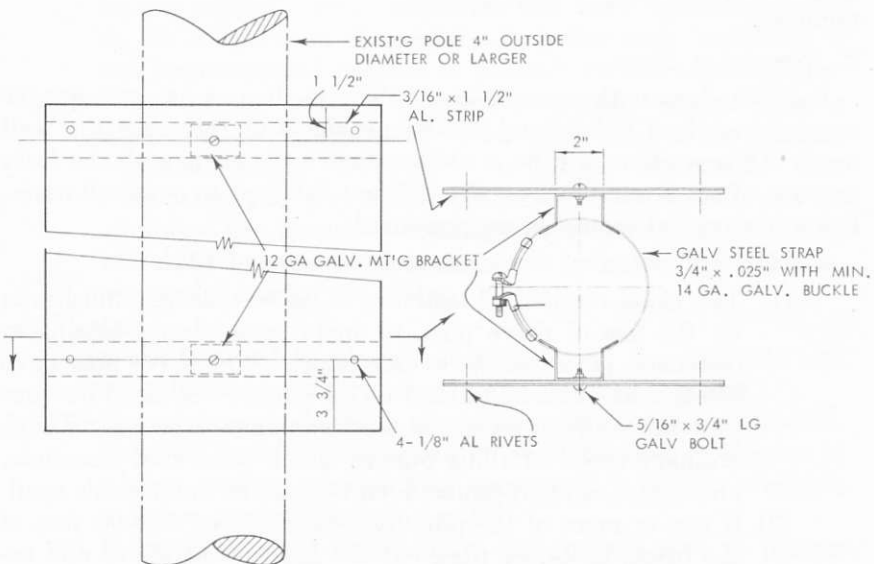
Mounting to existing 4"-diameter pole or larger.
